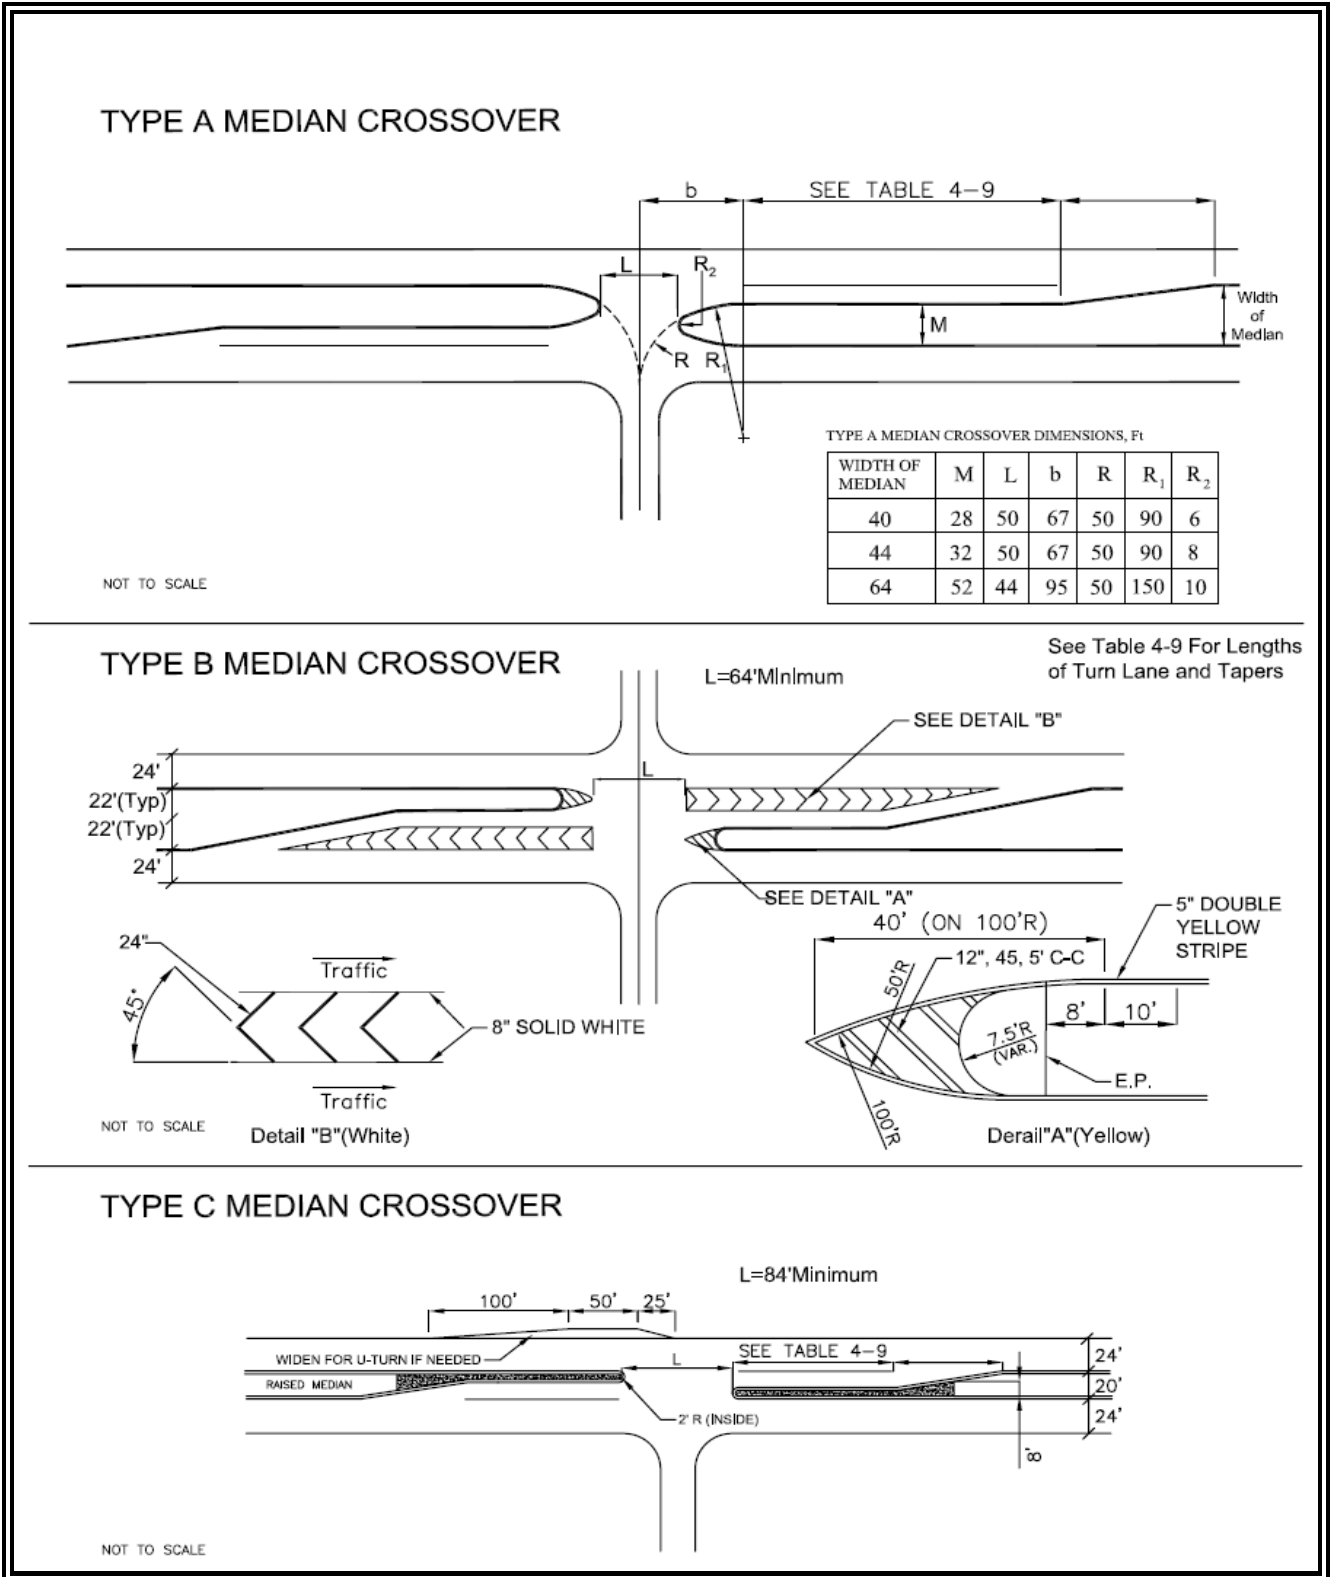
1 GEORGIA DOT CONSTRUCTION DETAILS FOR MEDIAN CROSSOVERS
